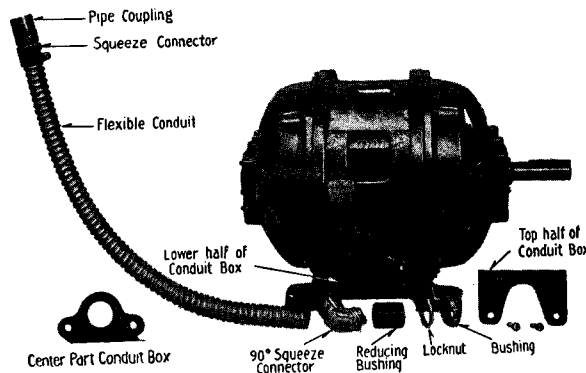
METHOD OF CONNECTING MOTOR TO LINE
